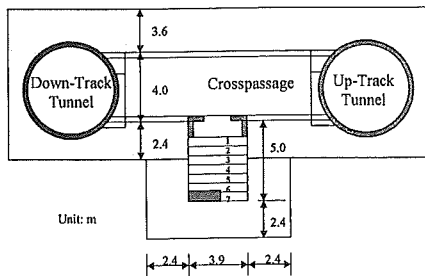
SJM treatment for excavation for the crosspassage and the sump
